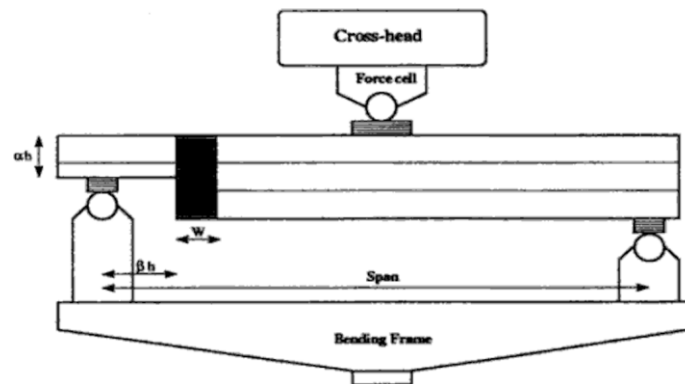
Bending/shear test set-up for notched beams (Coureau 2001).
